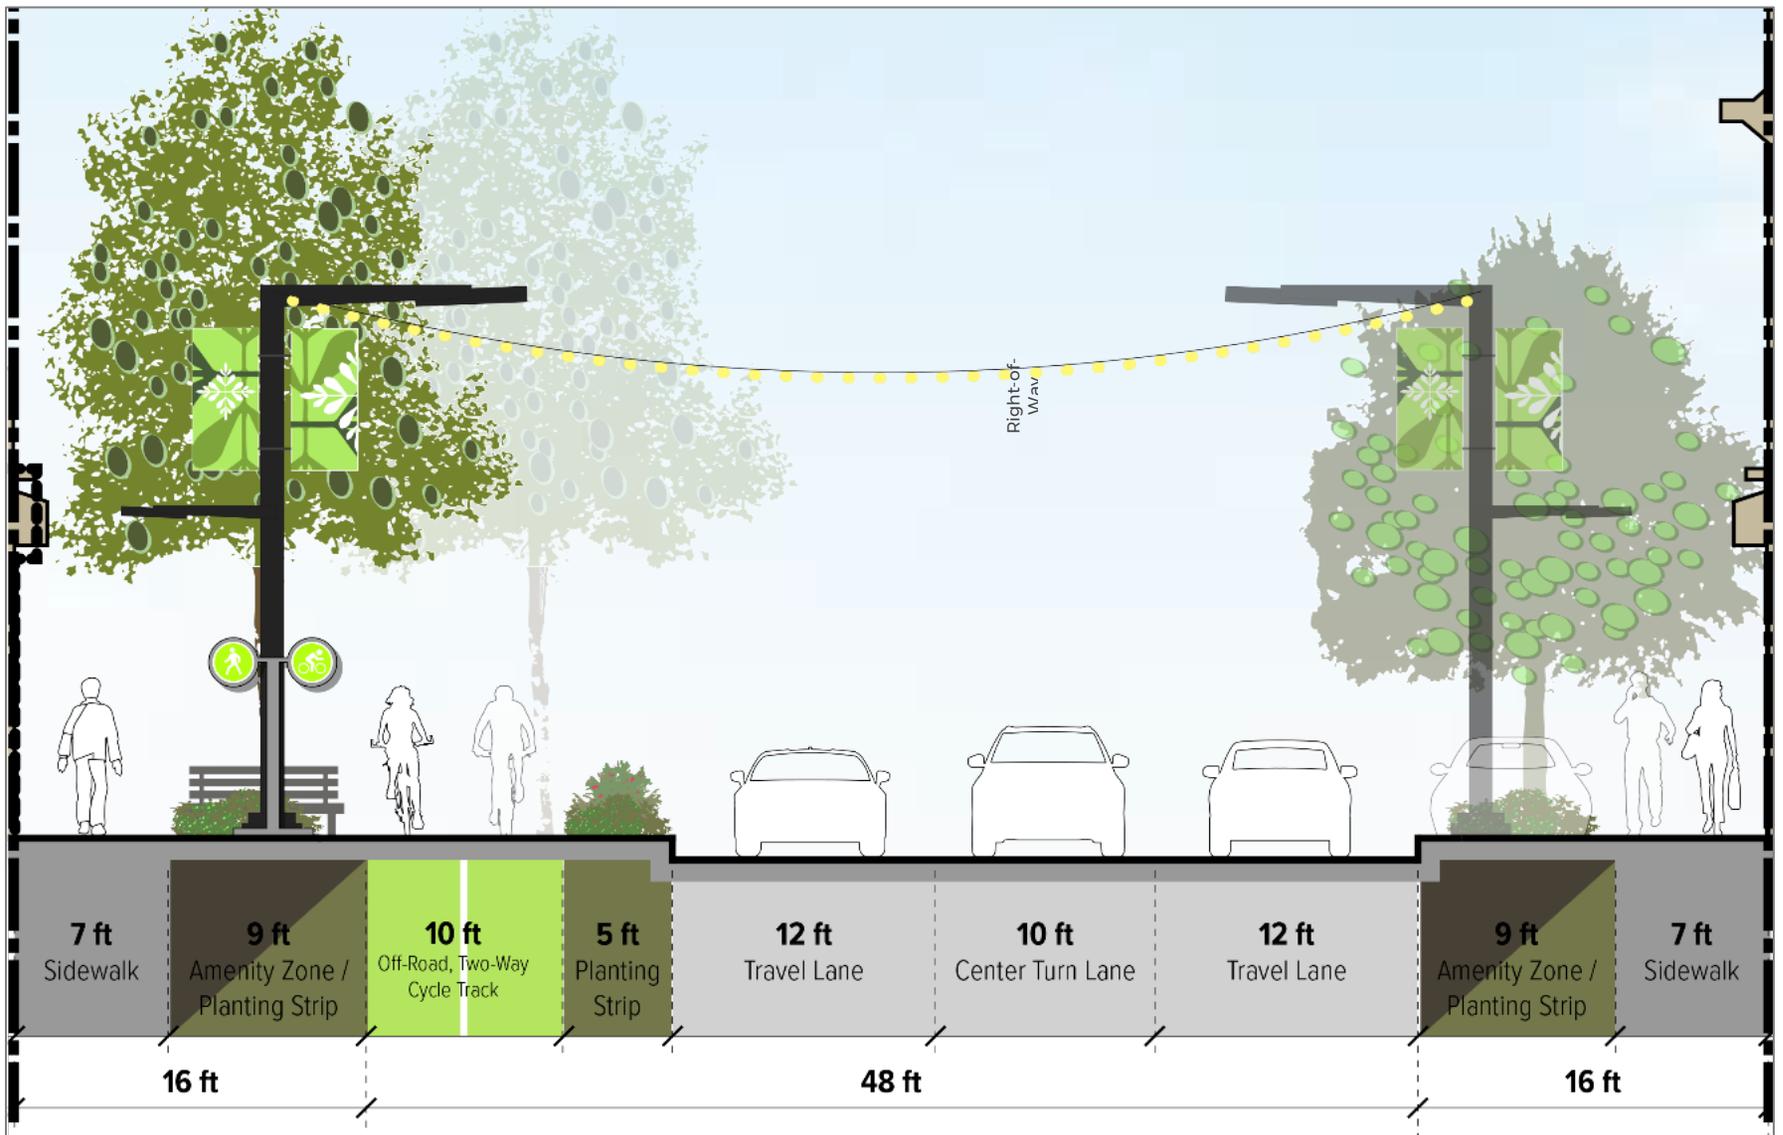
Proposed cross-section of Lee Road between Scottsdale & Lomond, looking north
